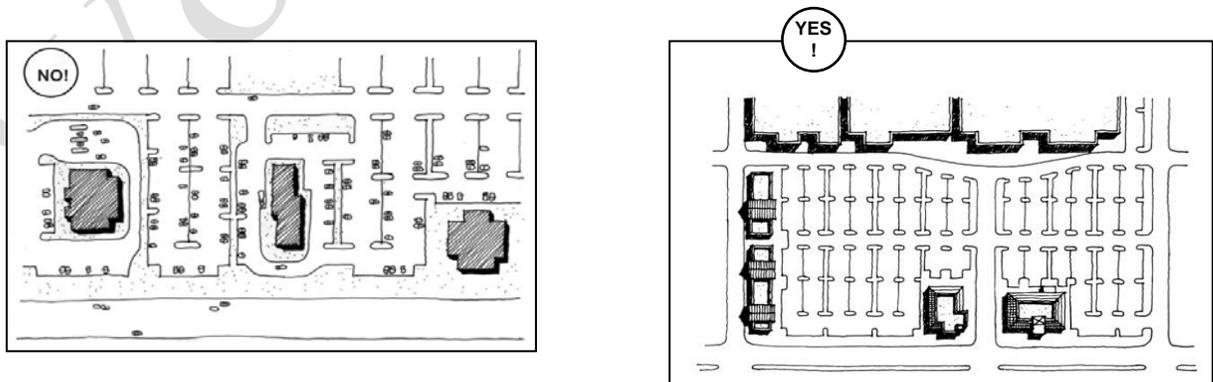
BUILDING ORIENTATION FOR MULTIPLE BUILDING DEVELOPMENT
